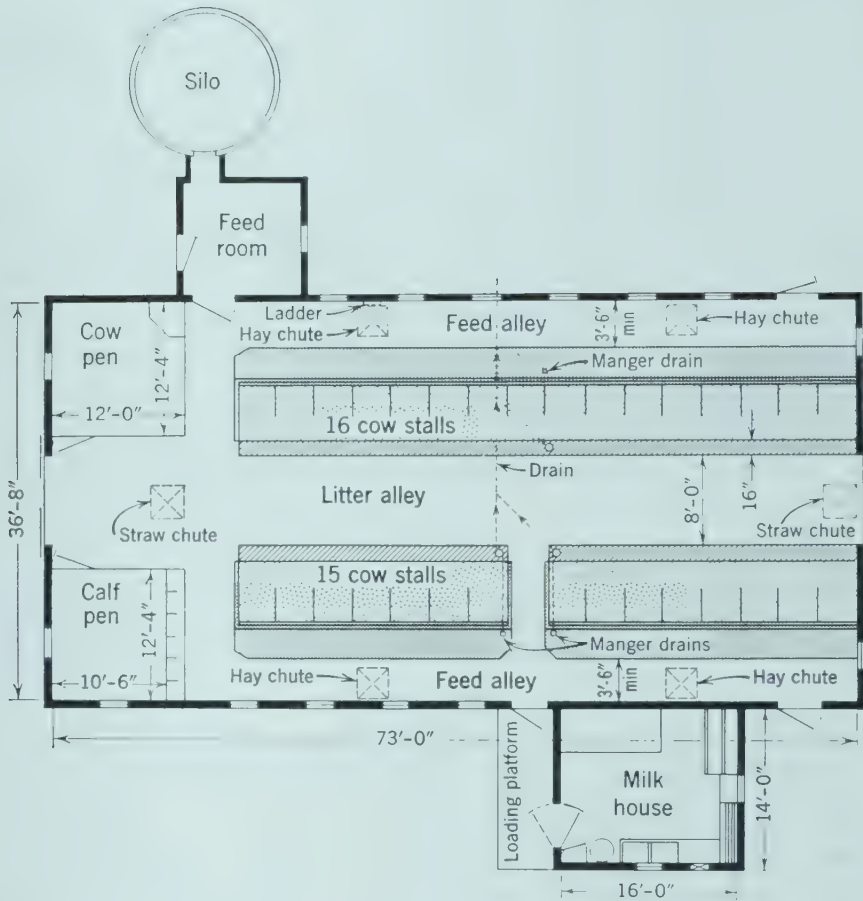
Well arranged plan for a two-story, 31-stall barn. The litter alley shown is designed for drive-through cleaning. If a gutter cleaner is installed, the width of the alley may be reduced to 6 ft and the width of the barn to 34 ft. (U.S. Department of Agriculture Information Bull. 123.)
